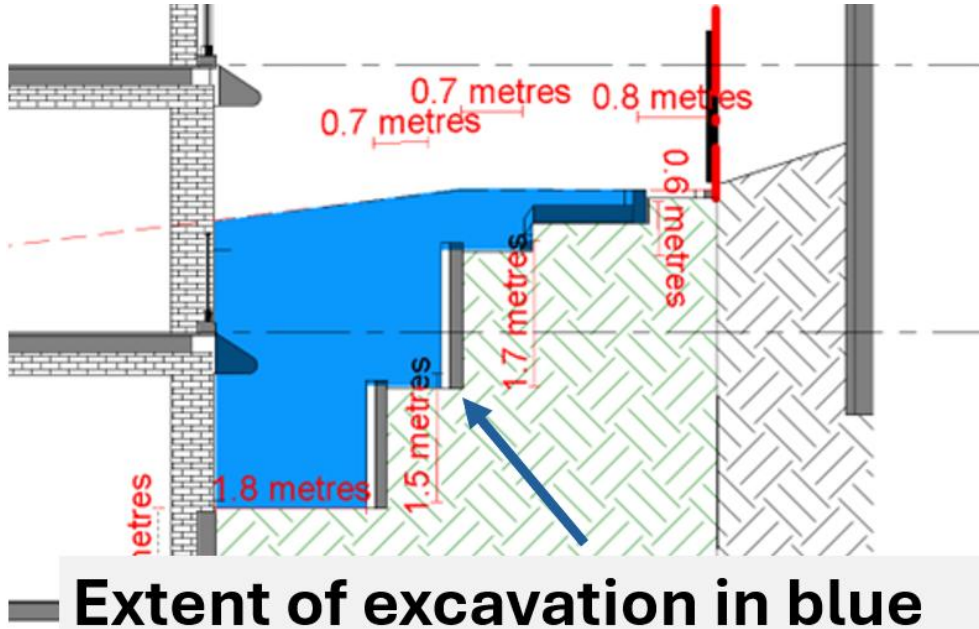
Building A - Northern Setback - multiple walls 4.9m excavation - no +3m min width (Source: Council's Landscape Officer)
